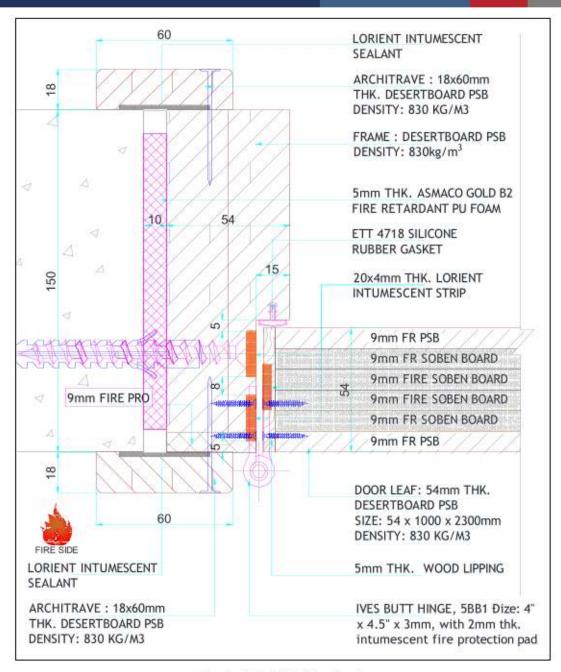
Detail E of drawing 5). (Drawing provided by the test sponsor)
